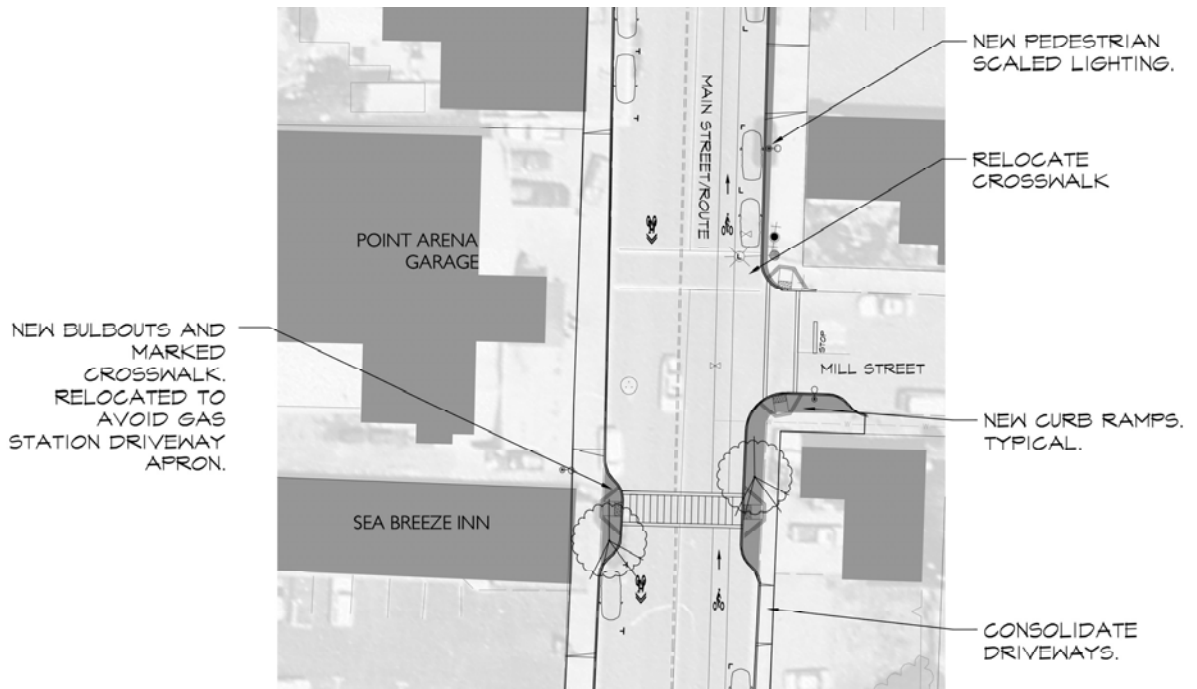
Streetscape Improvements Near the Intersection of Mill Street/Main Street
